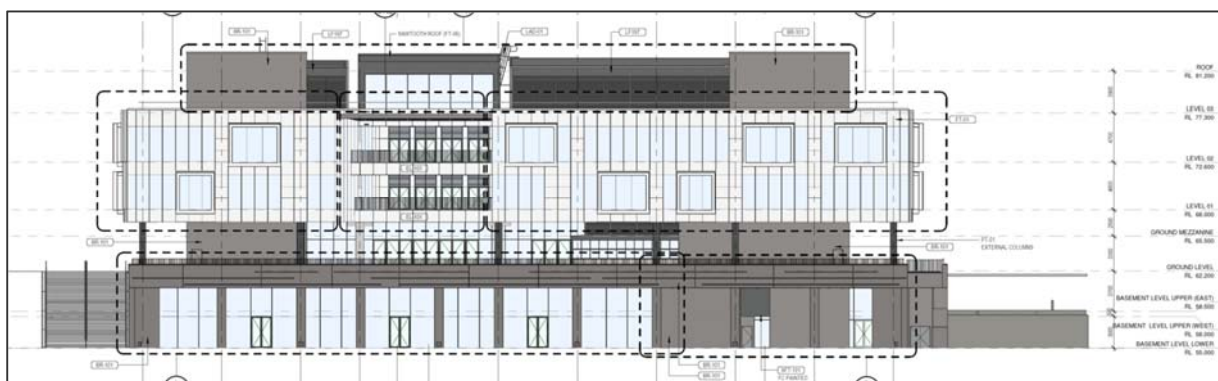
| Student Hub Northern Elevation (Source: RtS)
